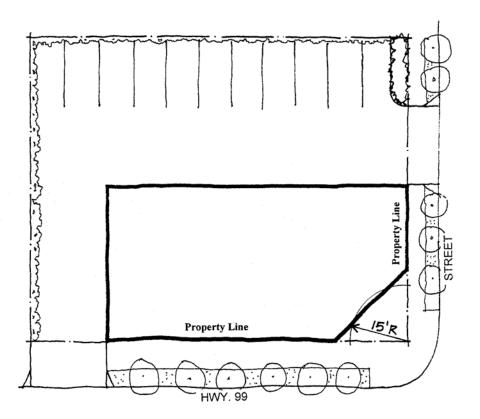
This building is located within 15 feet of the right-of-way line. The corner of the building is notched to provide a necessary sight distance triangle.
